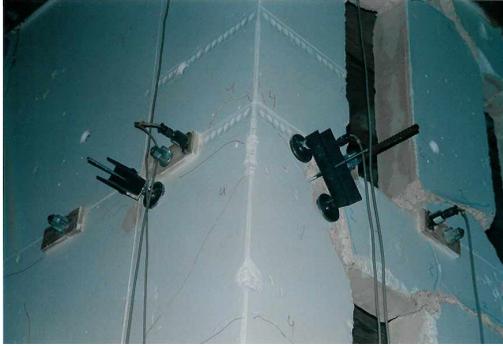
Connection of opposing walls with steel ties in the 3rd and 4th storeys
